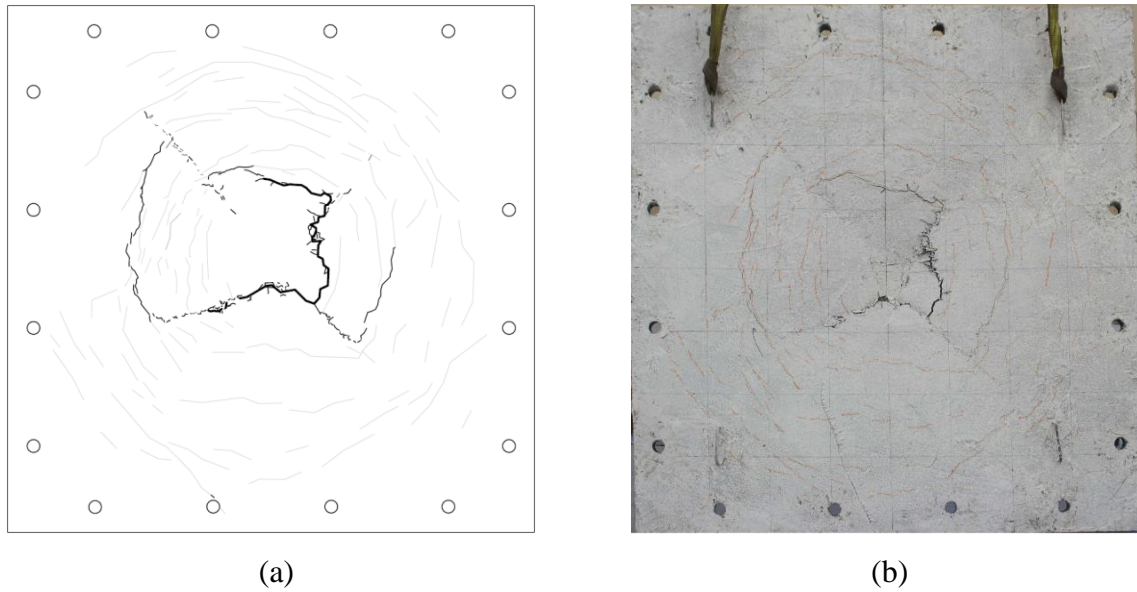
Top surface crack patterns after testing for panel JN2-125+PVA
